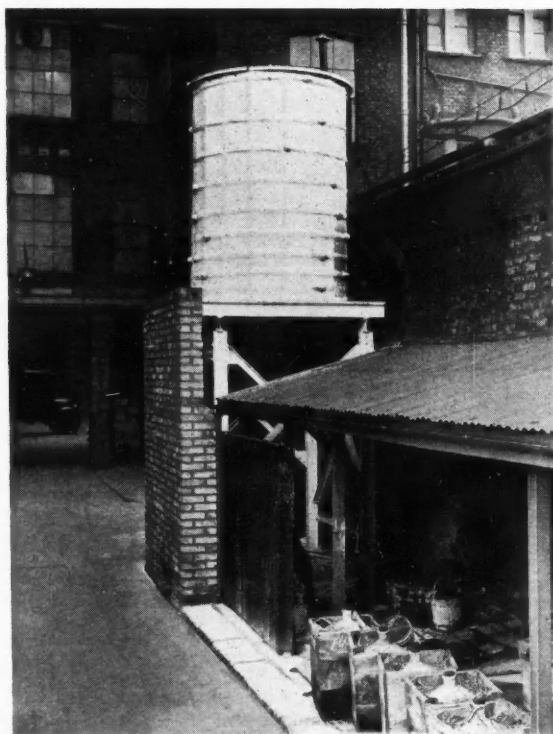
Nordac Patent Rubber Concrete Storage Tank erected in a confined space in a London lamp factory.
